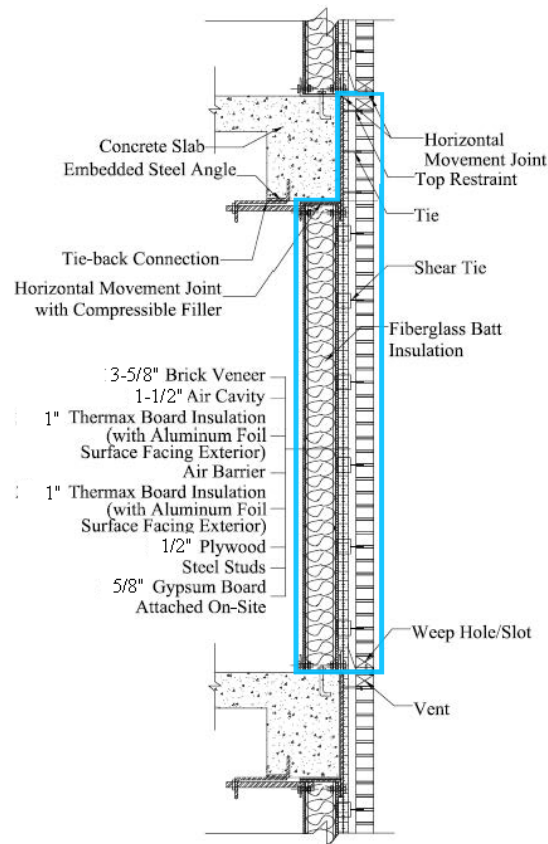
Elevation of PBVSS (Liang and Memari 2011)
